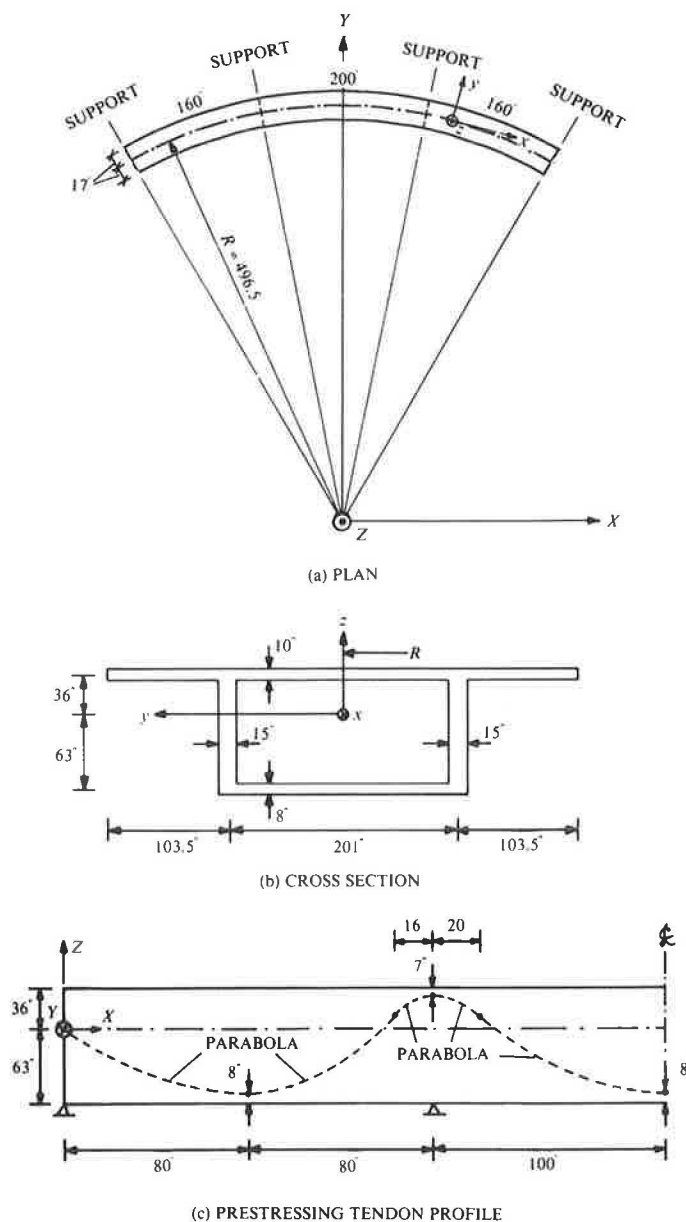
Example 2: three-span curved prestressed concrete bridge.
